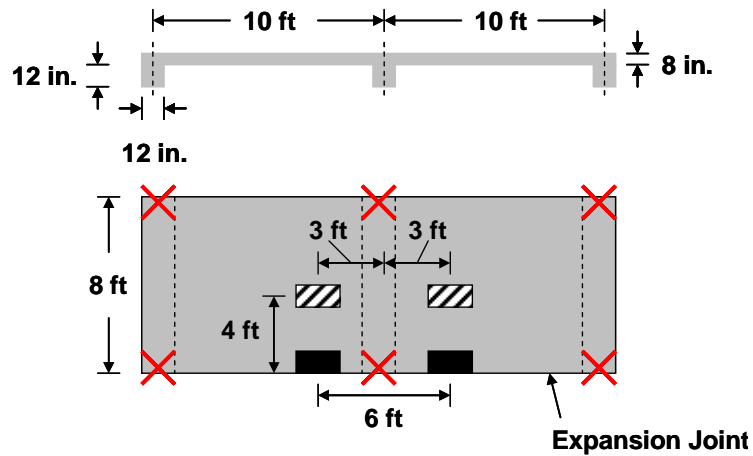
Cross Section and Plan Views of 3-D Model of Bridge Deck
